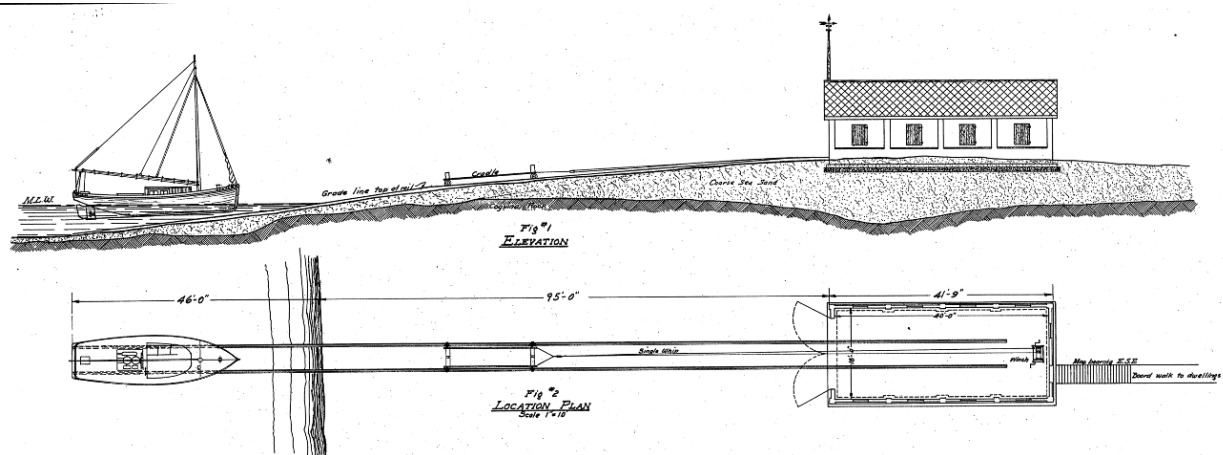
Elevation (above) and location plan (below) of Boat House from 1923 “Boat House & marine Railway” drawings.
